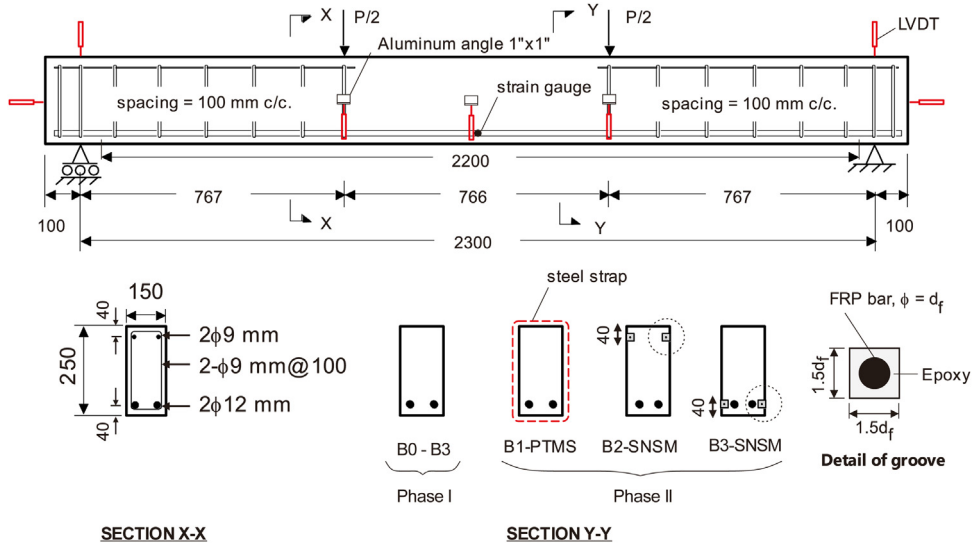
Reinforcement details of tested beams and instrumentation (units: mm).
